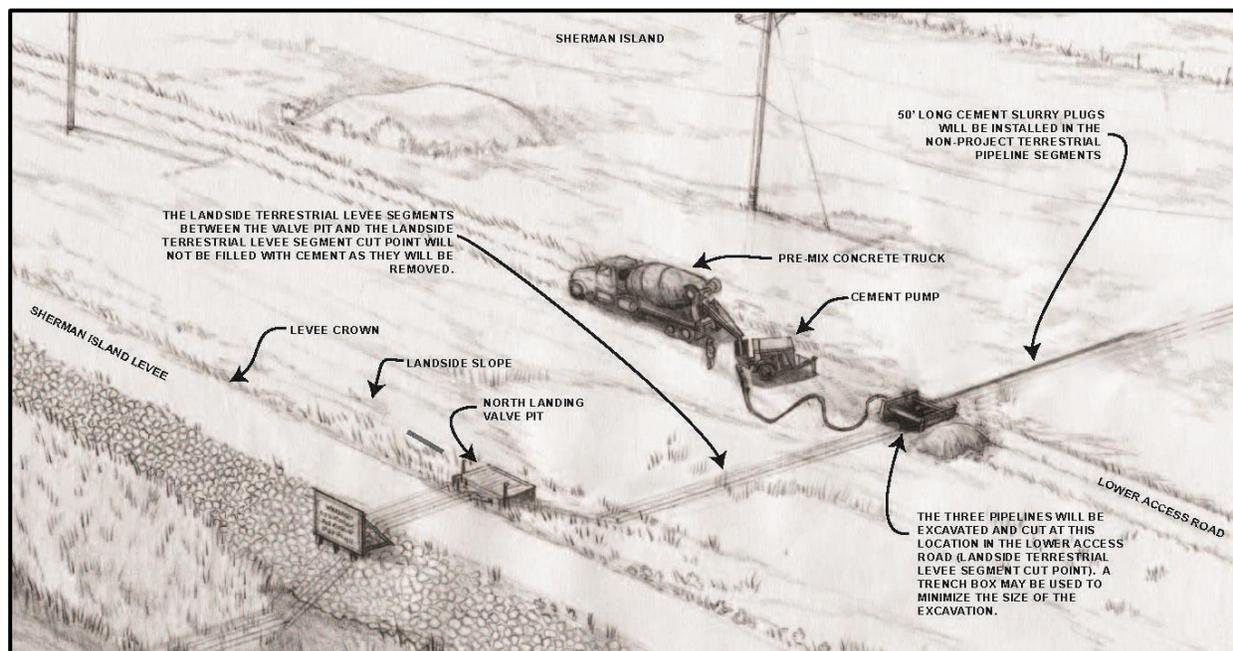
Cementing Landside Terrestrial Levee Segment (Northern Landing)
